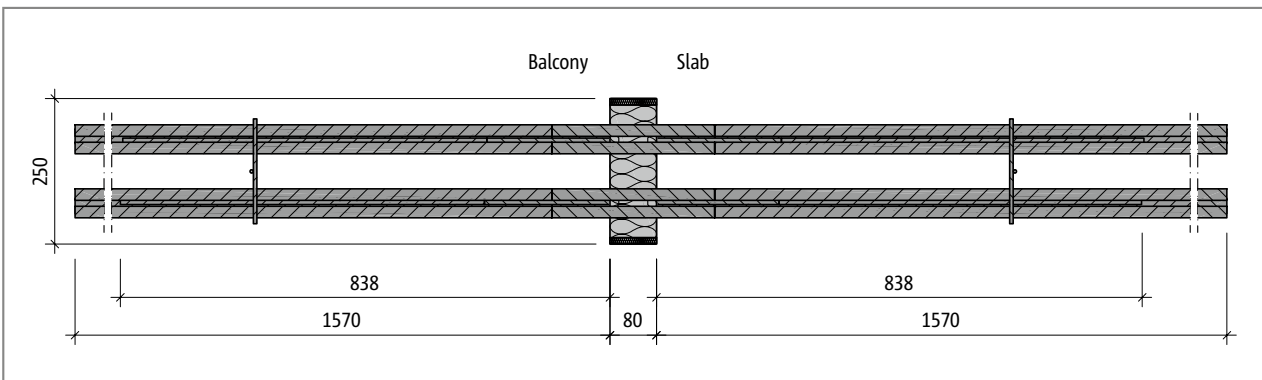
Schöck Isokorb® T type B-M3-V2: Product layout
